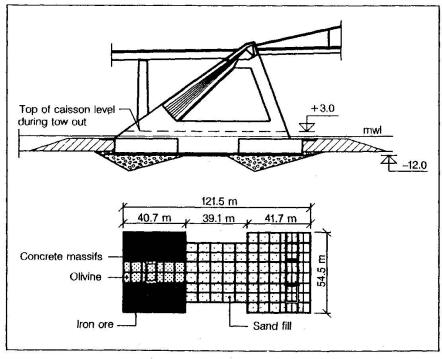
Elevation and Plan of Anchor Block Caisson. and
